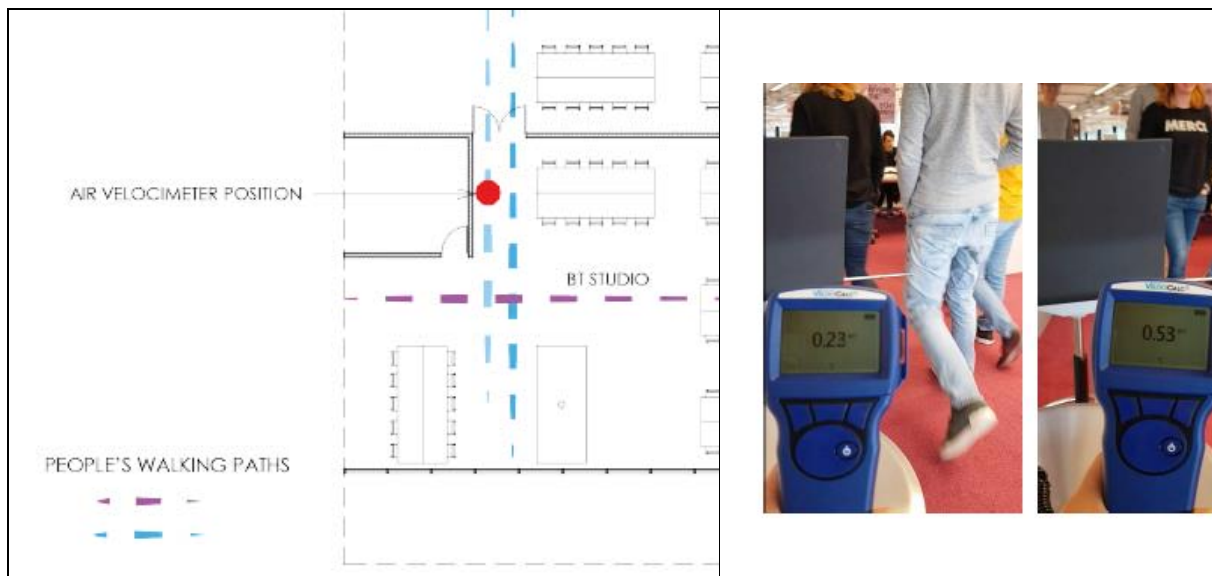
Building Technology Studie Floor plan, left, and group of four people walking from and towards the air velocity meter right [AR0125, 2019]
